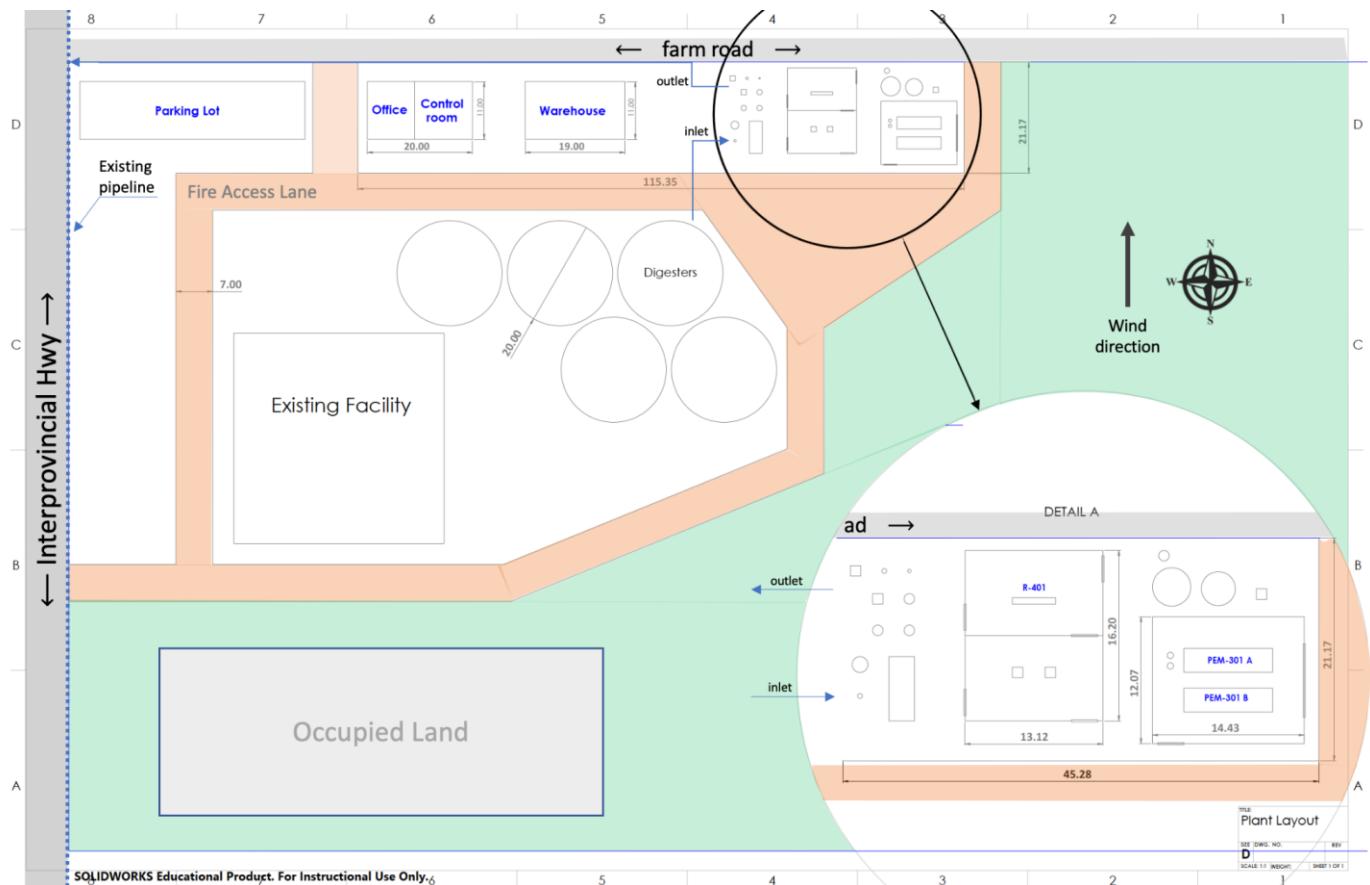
SOLIDWORKS 2-D drawing of the plant layout. DETAIL A shows the layout of the equipment. Unit of measurement is in meters.
